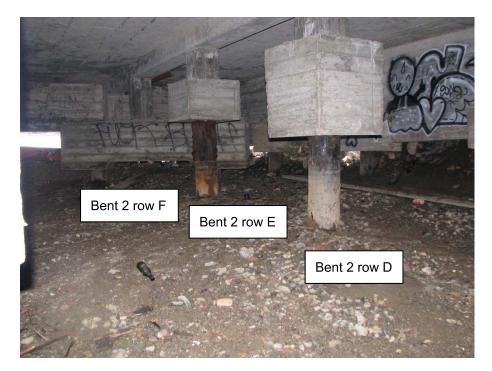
The southeast corner of the building is supported by piles out of the water as shown above. These piles are not encased in concrete. Bent 2 row D, E and F. Note that row F has an atypical pile arrangement with two piles and a cap beam supporting a column. The soil in this area was damp but did not appear to be regularly inundated by the tide.
